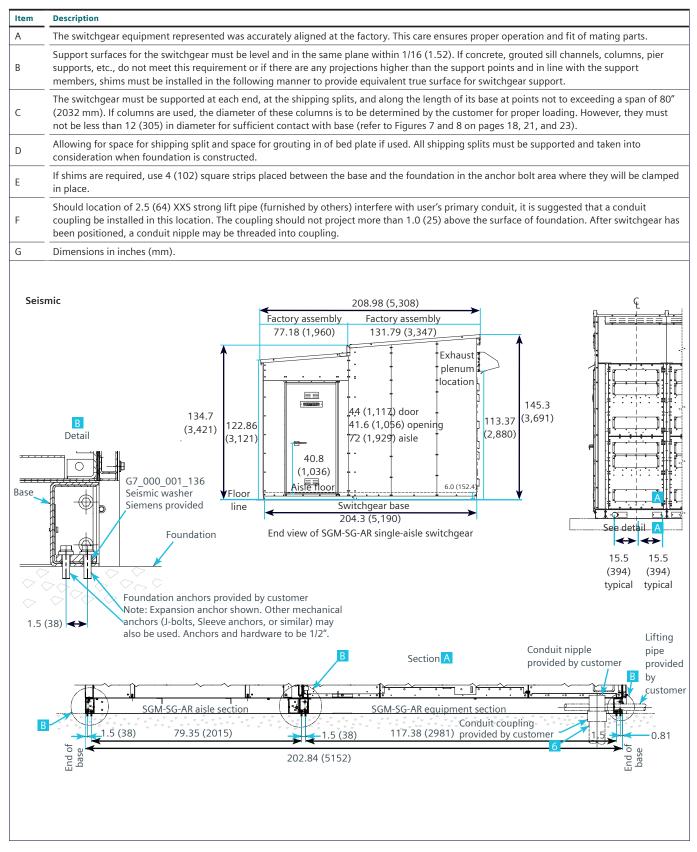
Anchoring outdoor type SGM-SG-AR Shelter-Clad single-aisle switchgear rated 27kV
